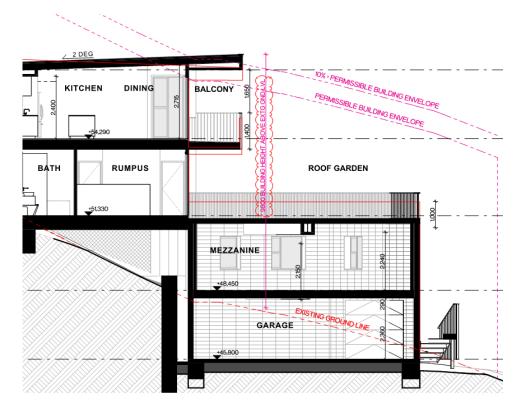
extent of building height exceedance (limited predominantly to roof element projecting above upper floor balcony).
